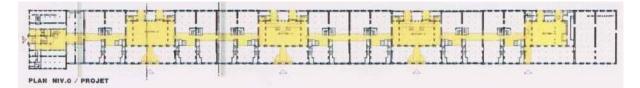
Internal street created along the ground floor - Source: Castaldi Architecte.
